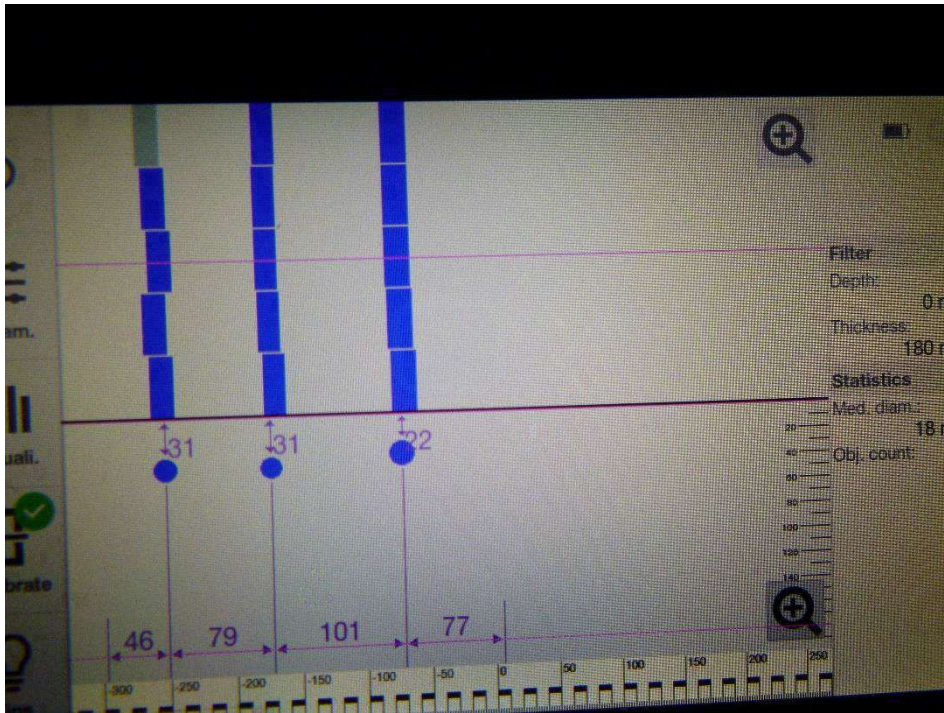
West half joint south face lower nib, scanned horizontally to show shear link reinforcement.
